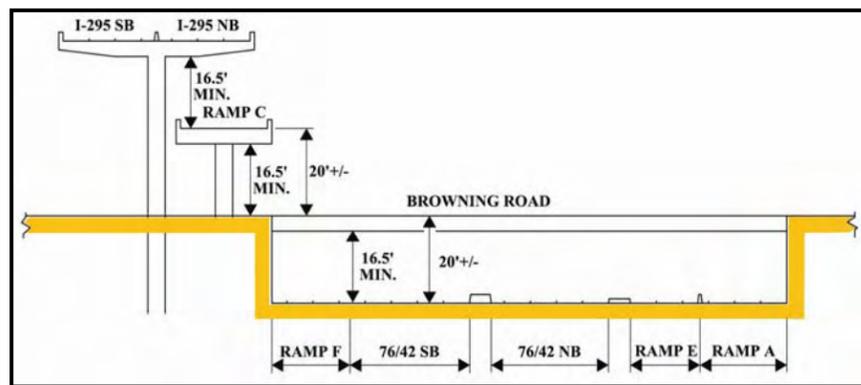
Section A-A at Browning Road (Alternative A)
